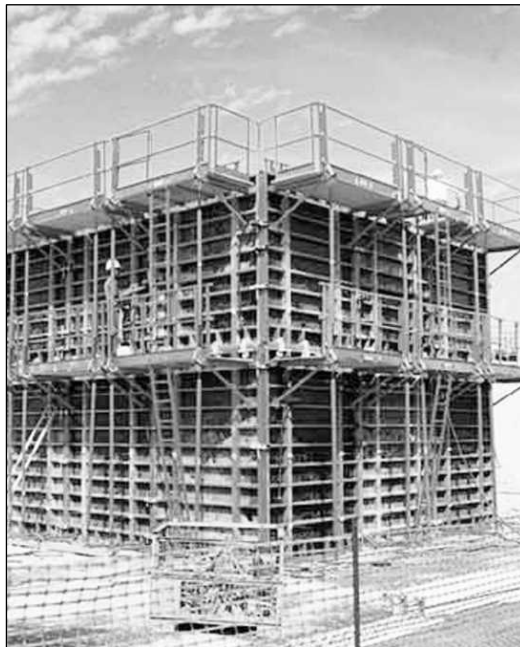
Trio Platform Formwork System (Courtesy PERI).
